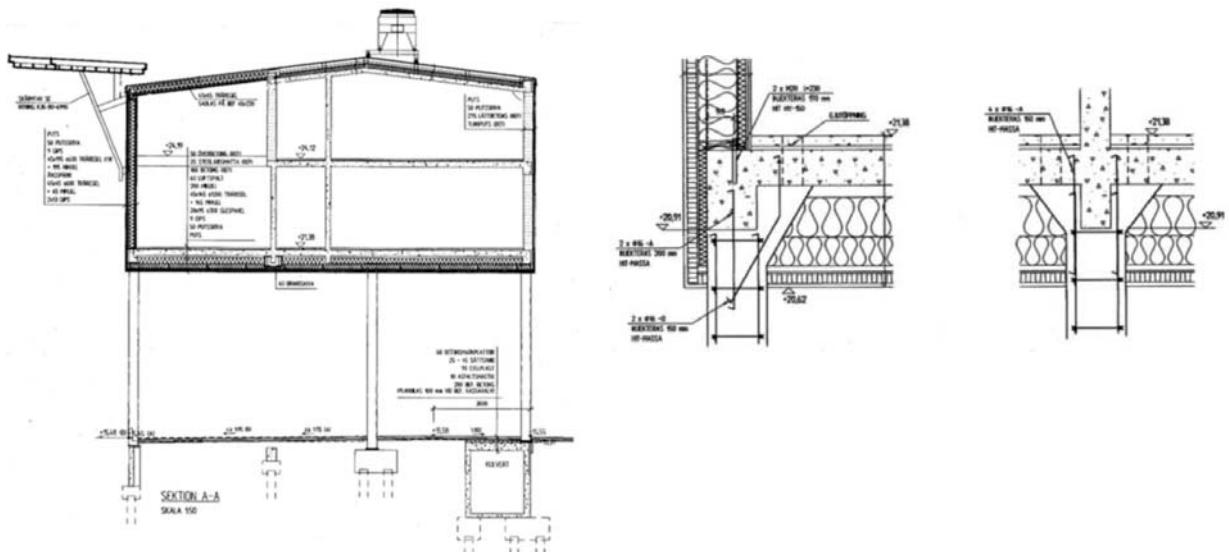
The section and the details show the new floor and wall structures above the portico, with the new insulation layers.
